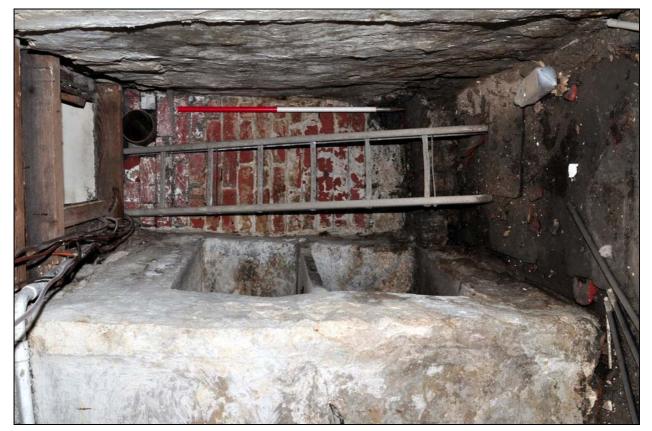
Cellar: looking south-west towards blocked doorway in wall with Farmhouse
